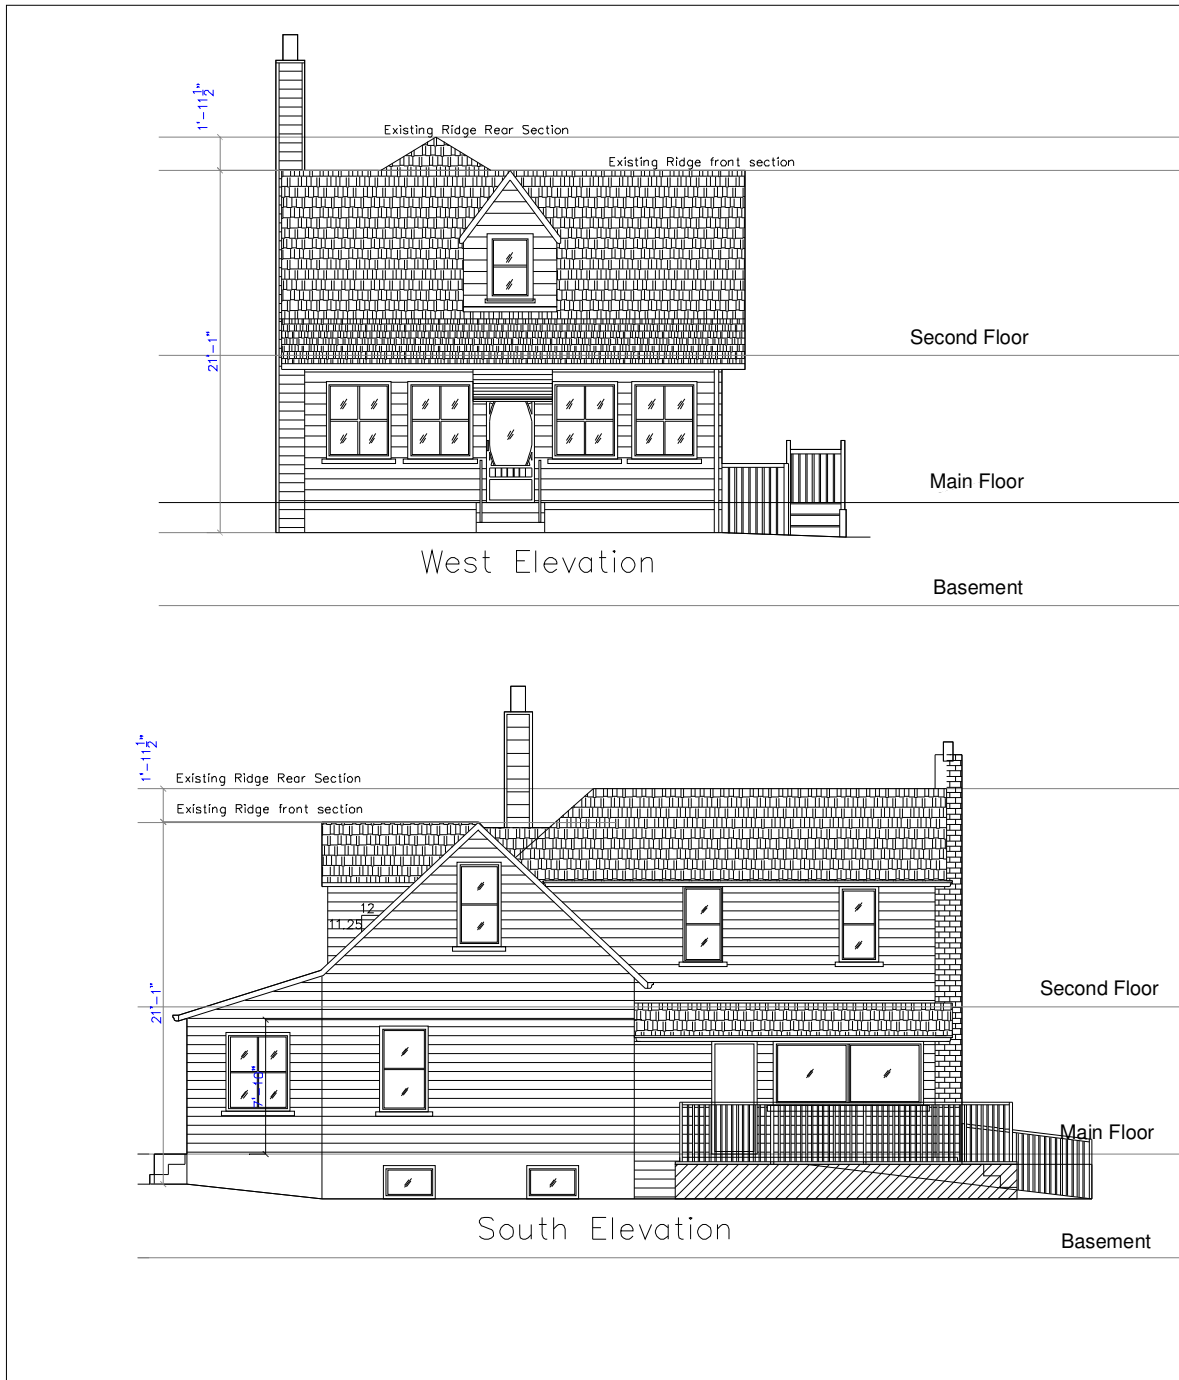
Street elevations of the existing house. Mississauga Road South, above. Bay Street, below.
